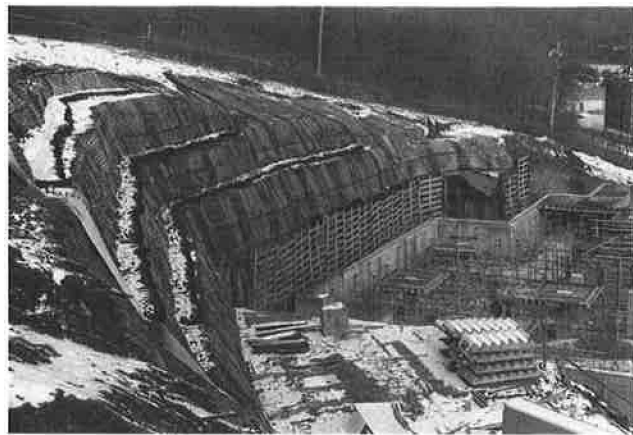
Geotextile-geogrid-faced permanent slope and geotextile-timber-grillage-faced temporary slope.
